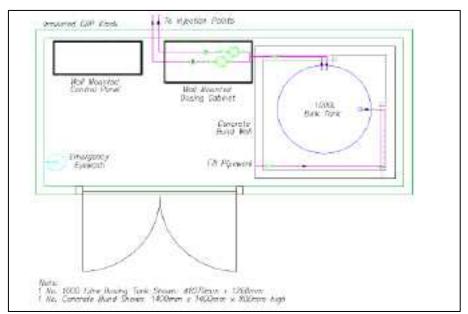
IW schematic of bulk tank kiosk layout in H3PO4 Installation with 500 litres < bulk storage  $\le$  6,000 litres.
